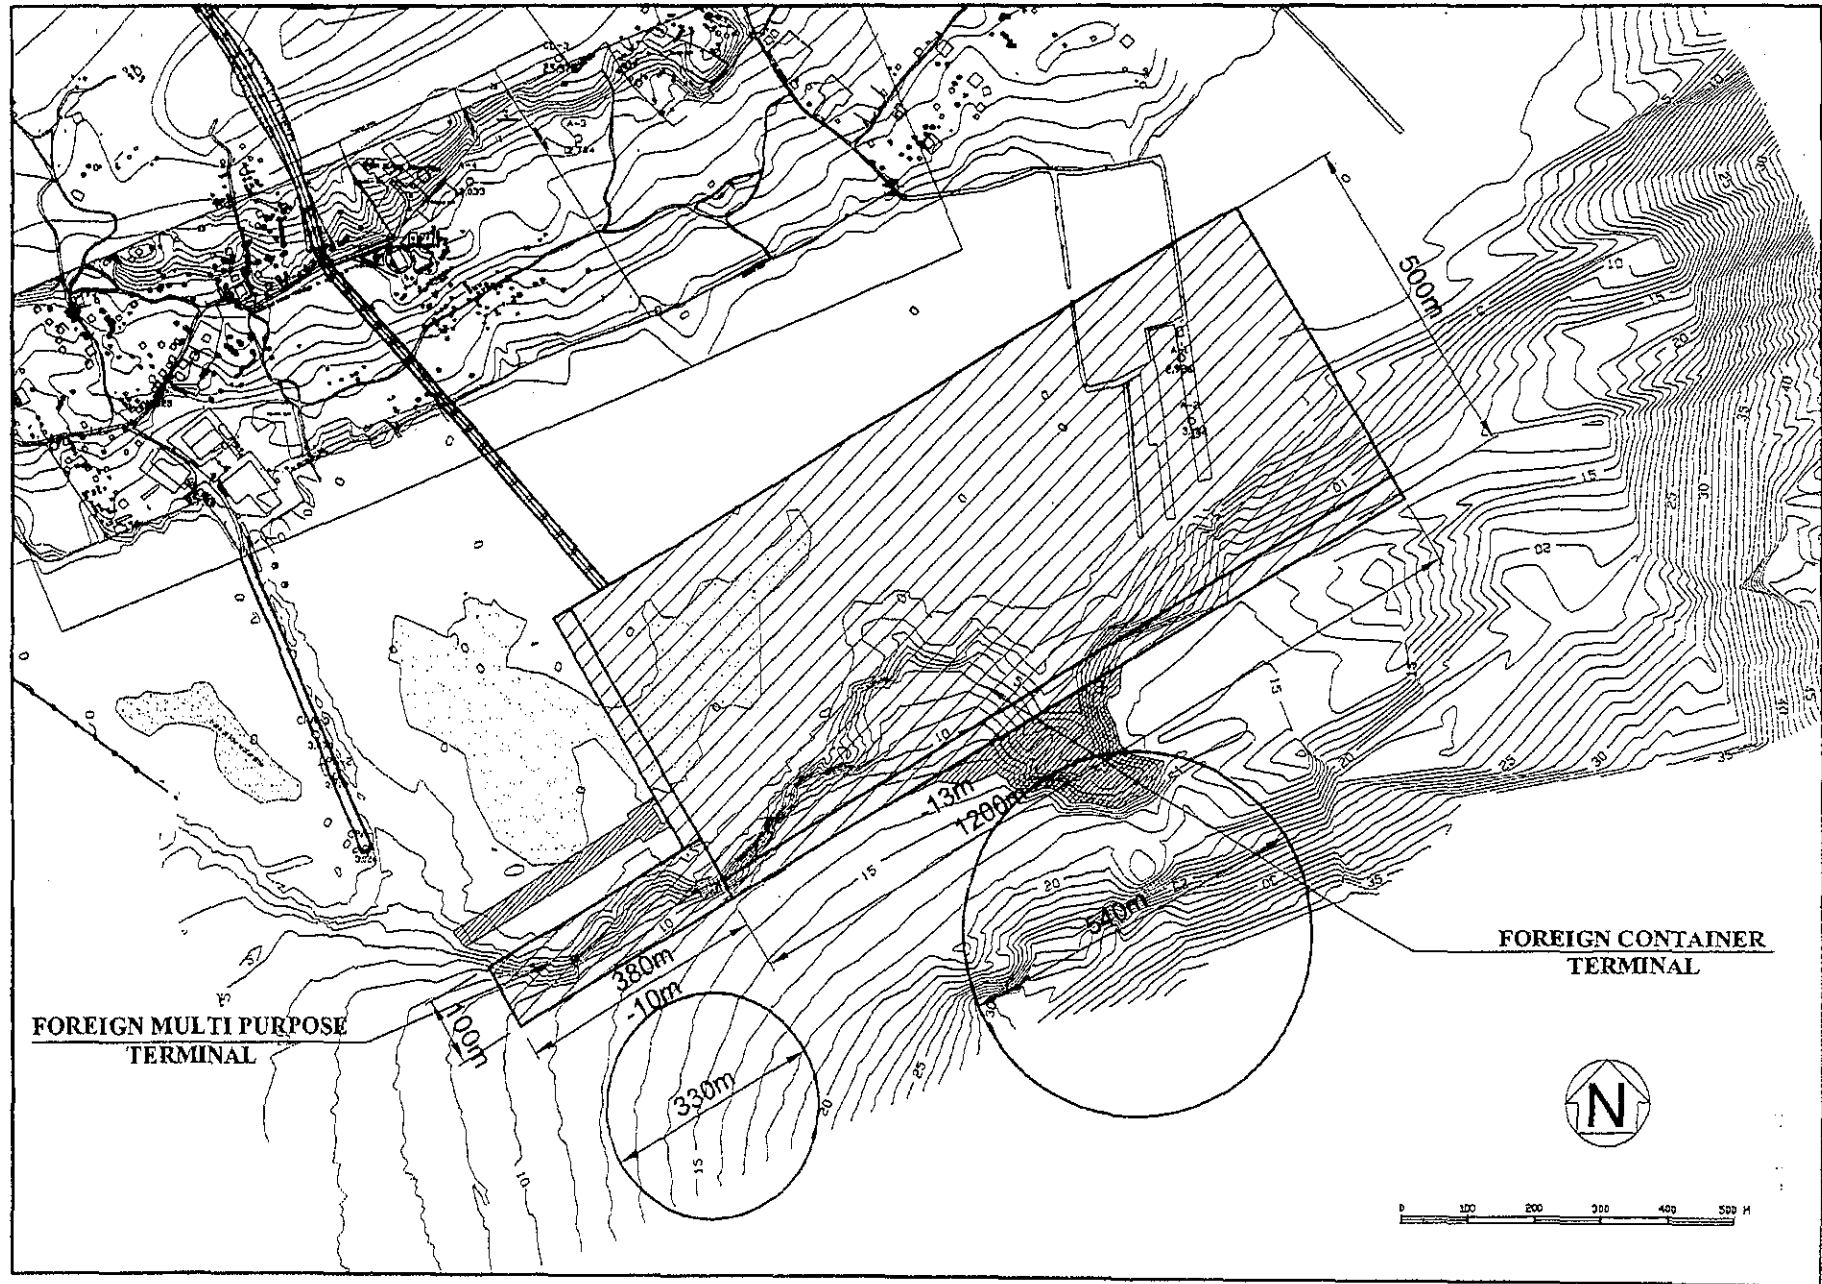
New Cebu Port Layout Plan (Alternative 2)
